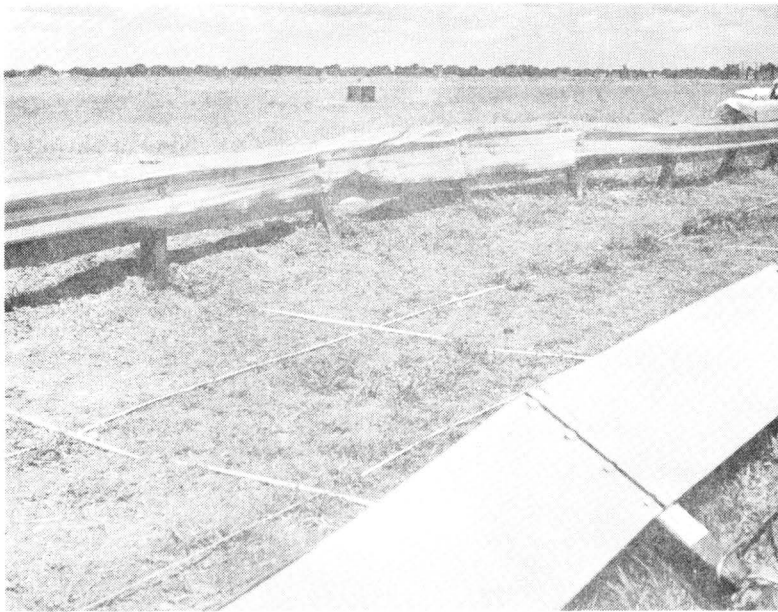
, Damage To Second Guardrail (505-9A)
